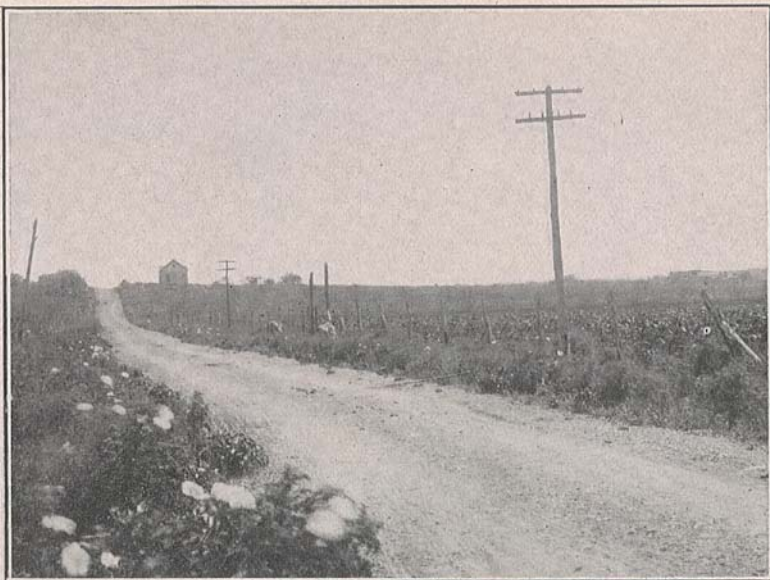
Gravel Road Between Montopolis Bridge and Pilot Knob,
